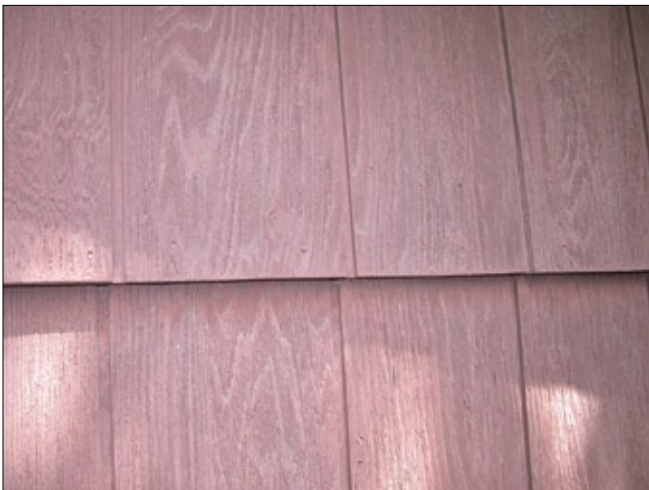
A shingle lap horizontal joint in plywood panel siding. At the time this photo was taken, the joint shown had performed adequately for in excess of four decades with no maintenance.
